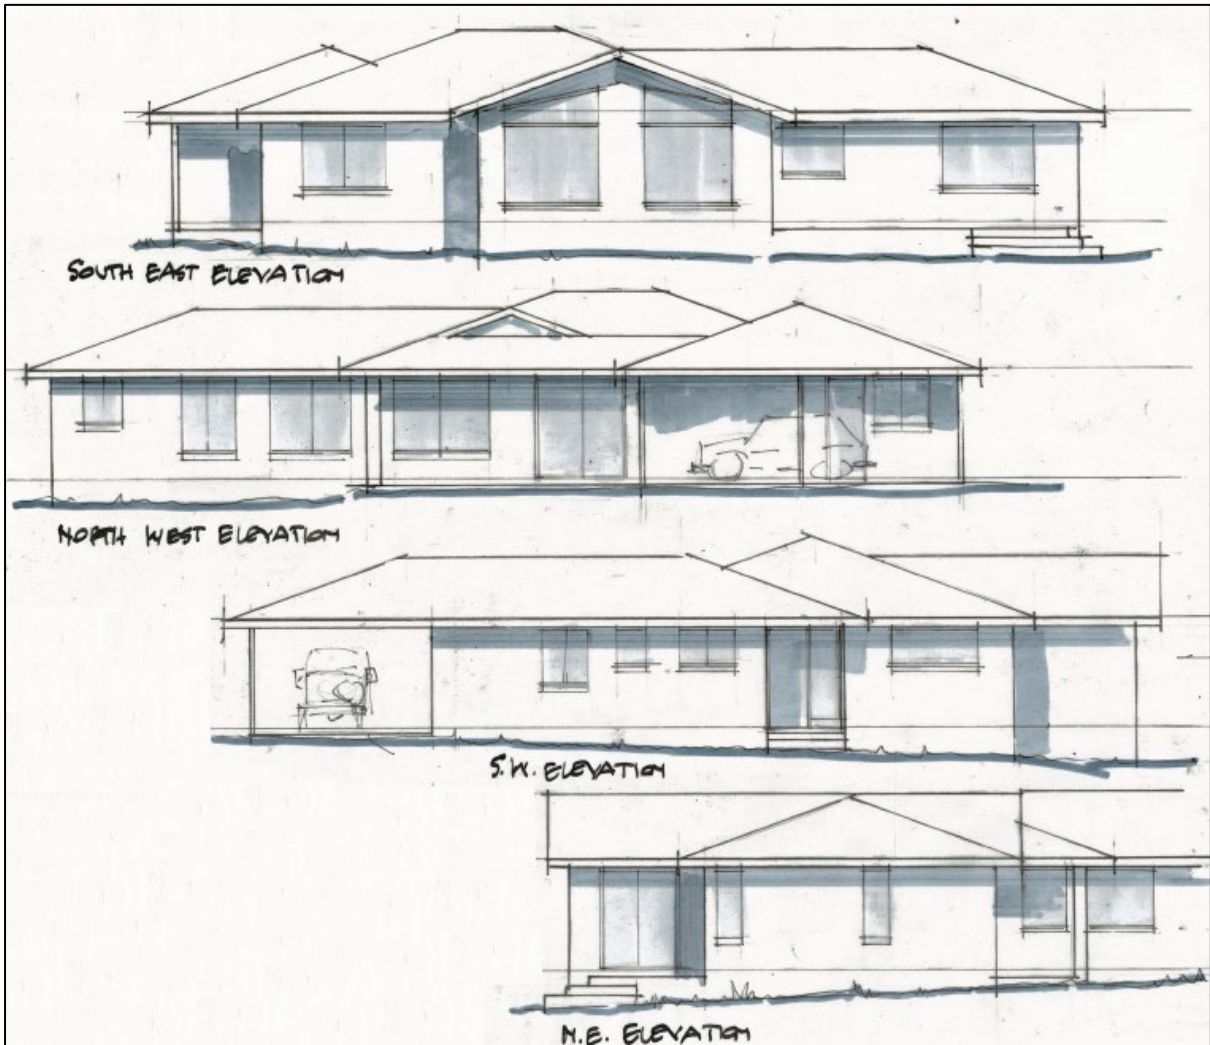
Farm dwelling elevation plans (Source: Building Design Service).
